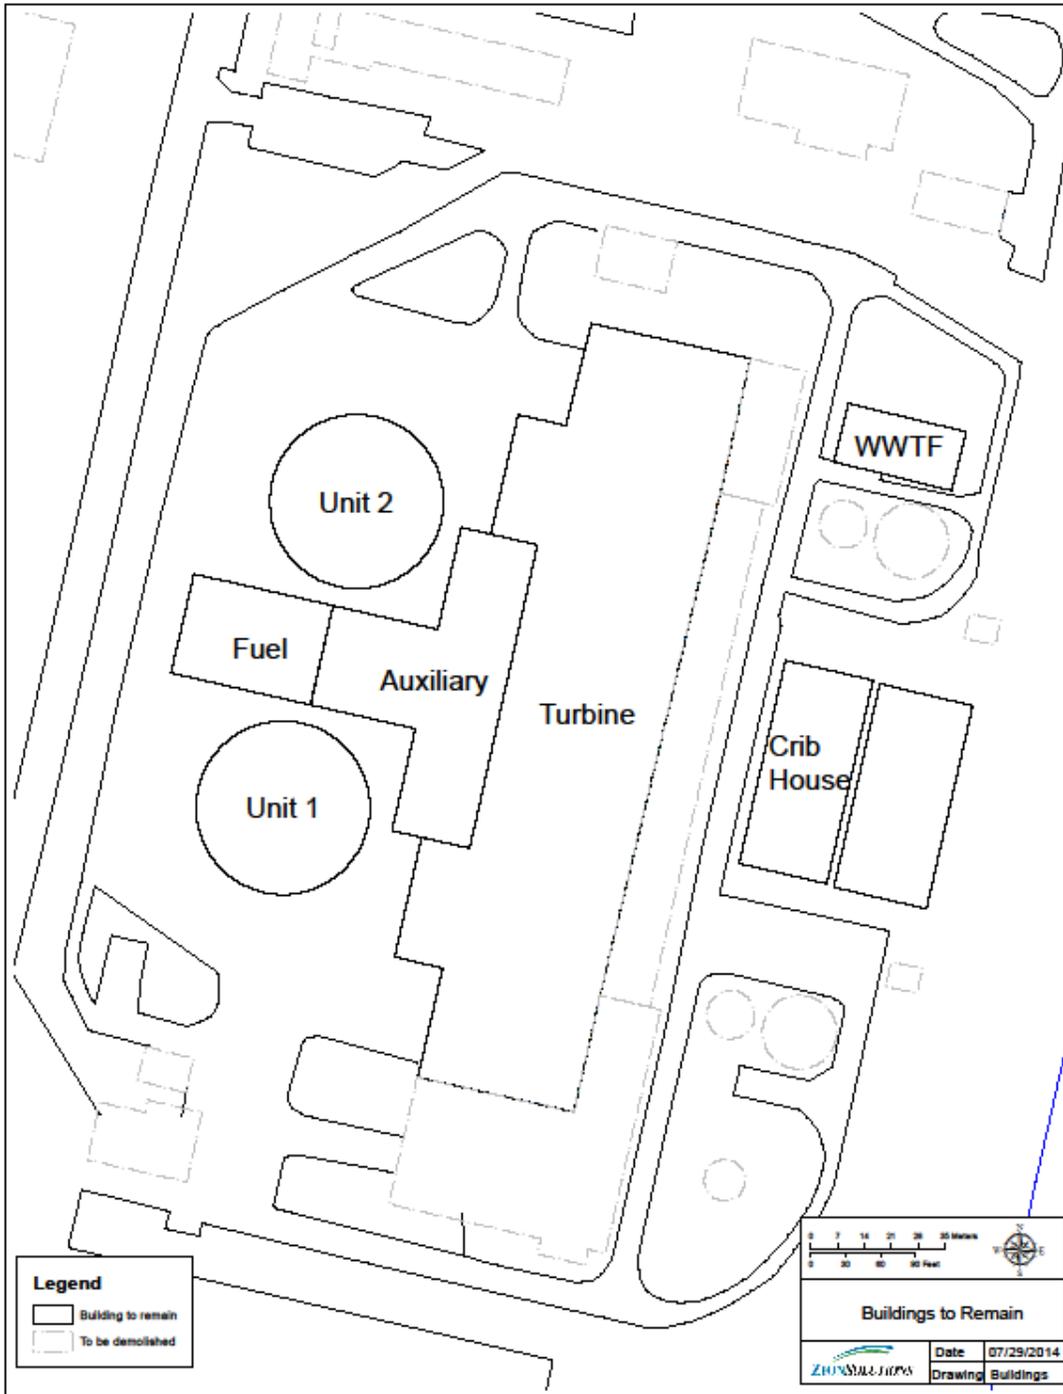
Zion Site layout for buildings that will have a residual underground structure.
